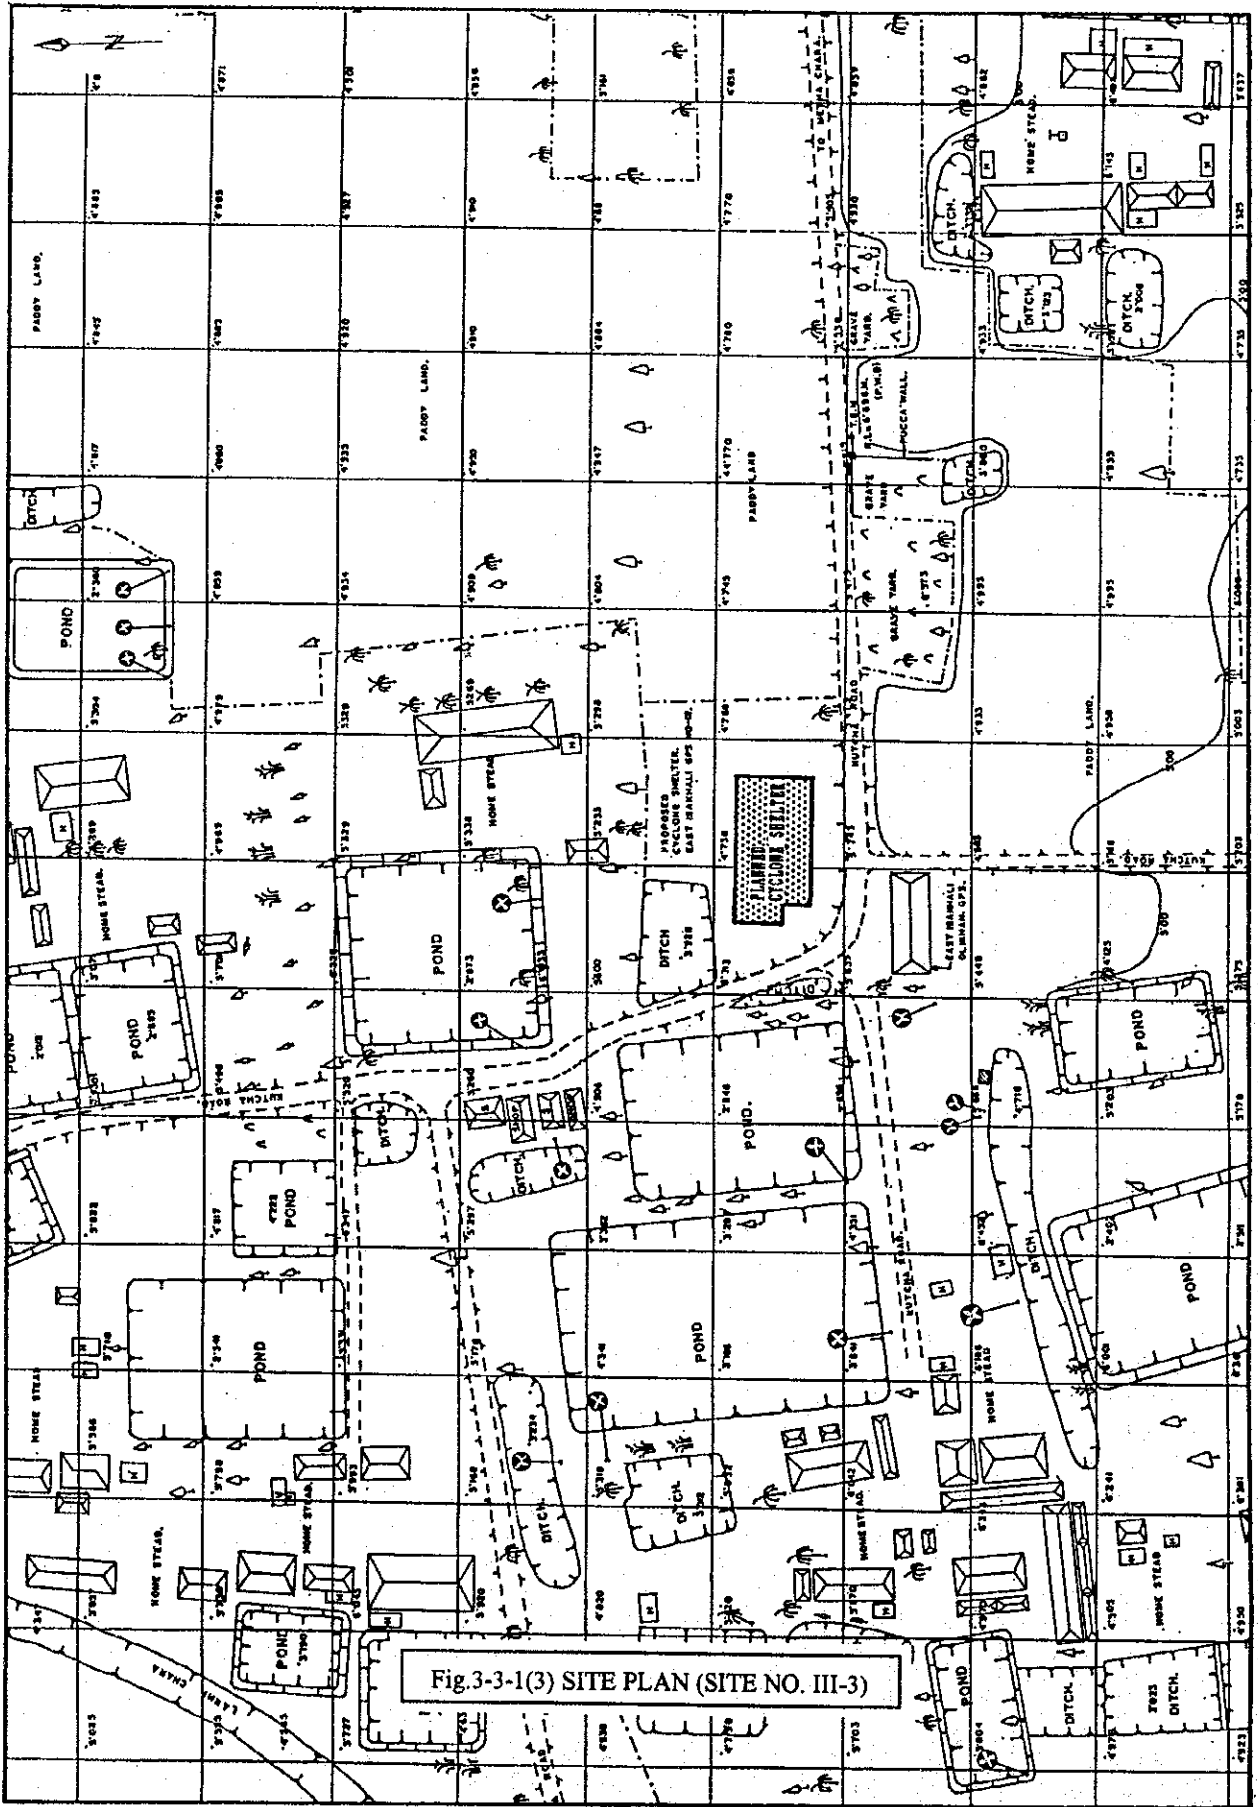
(3) SITE PLAN (SITE NO. III-3)
